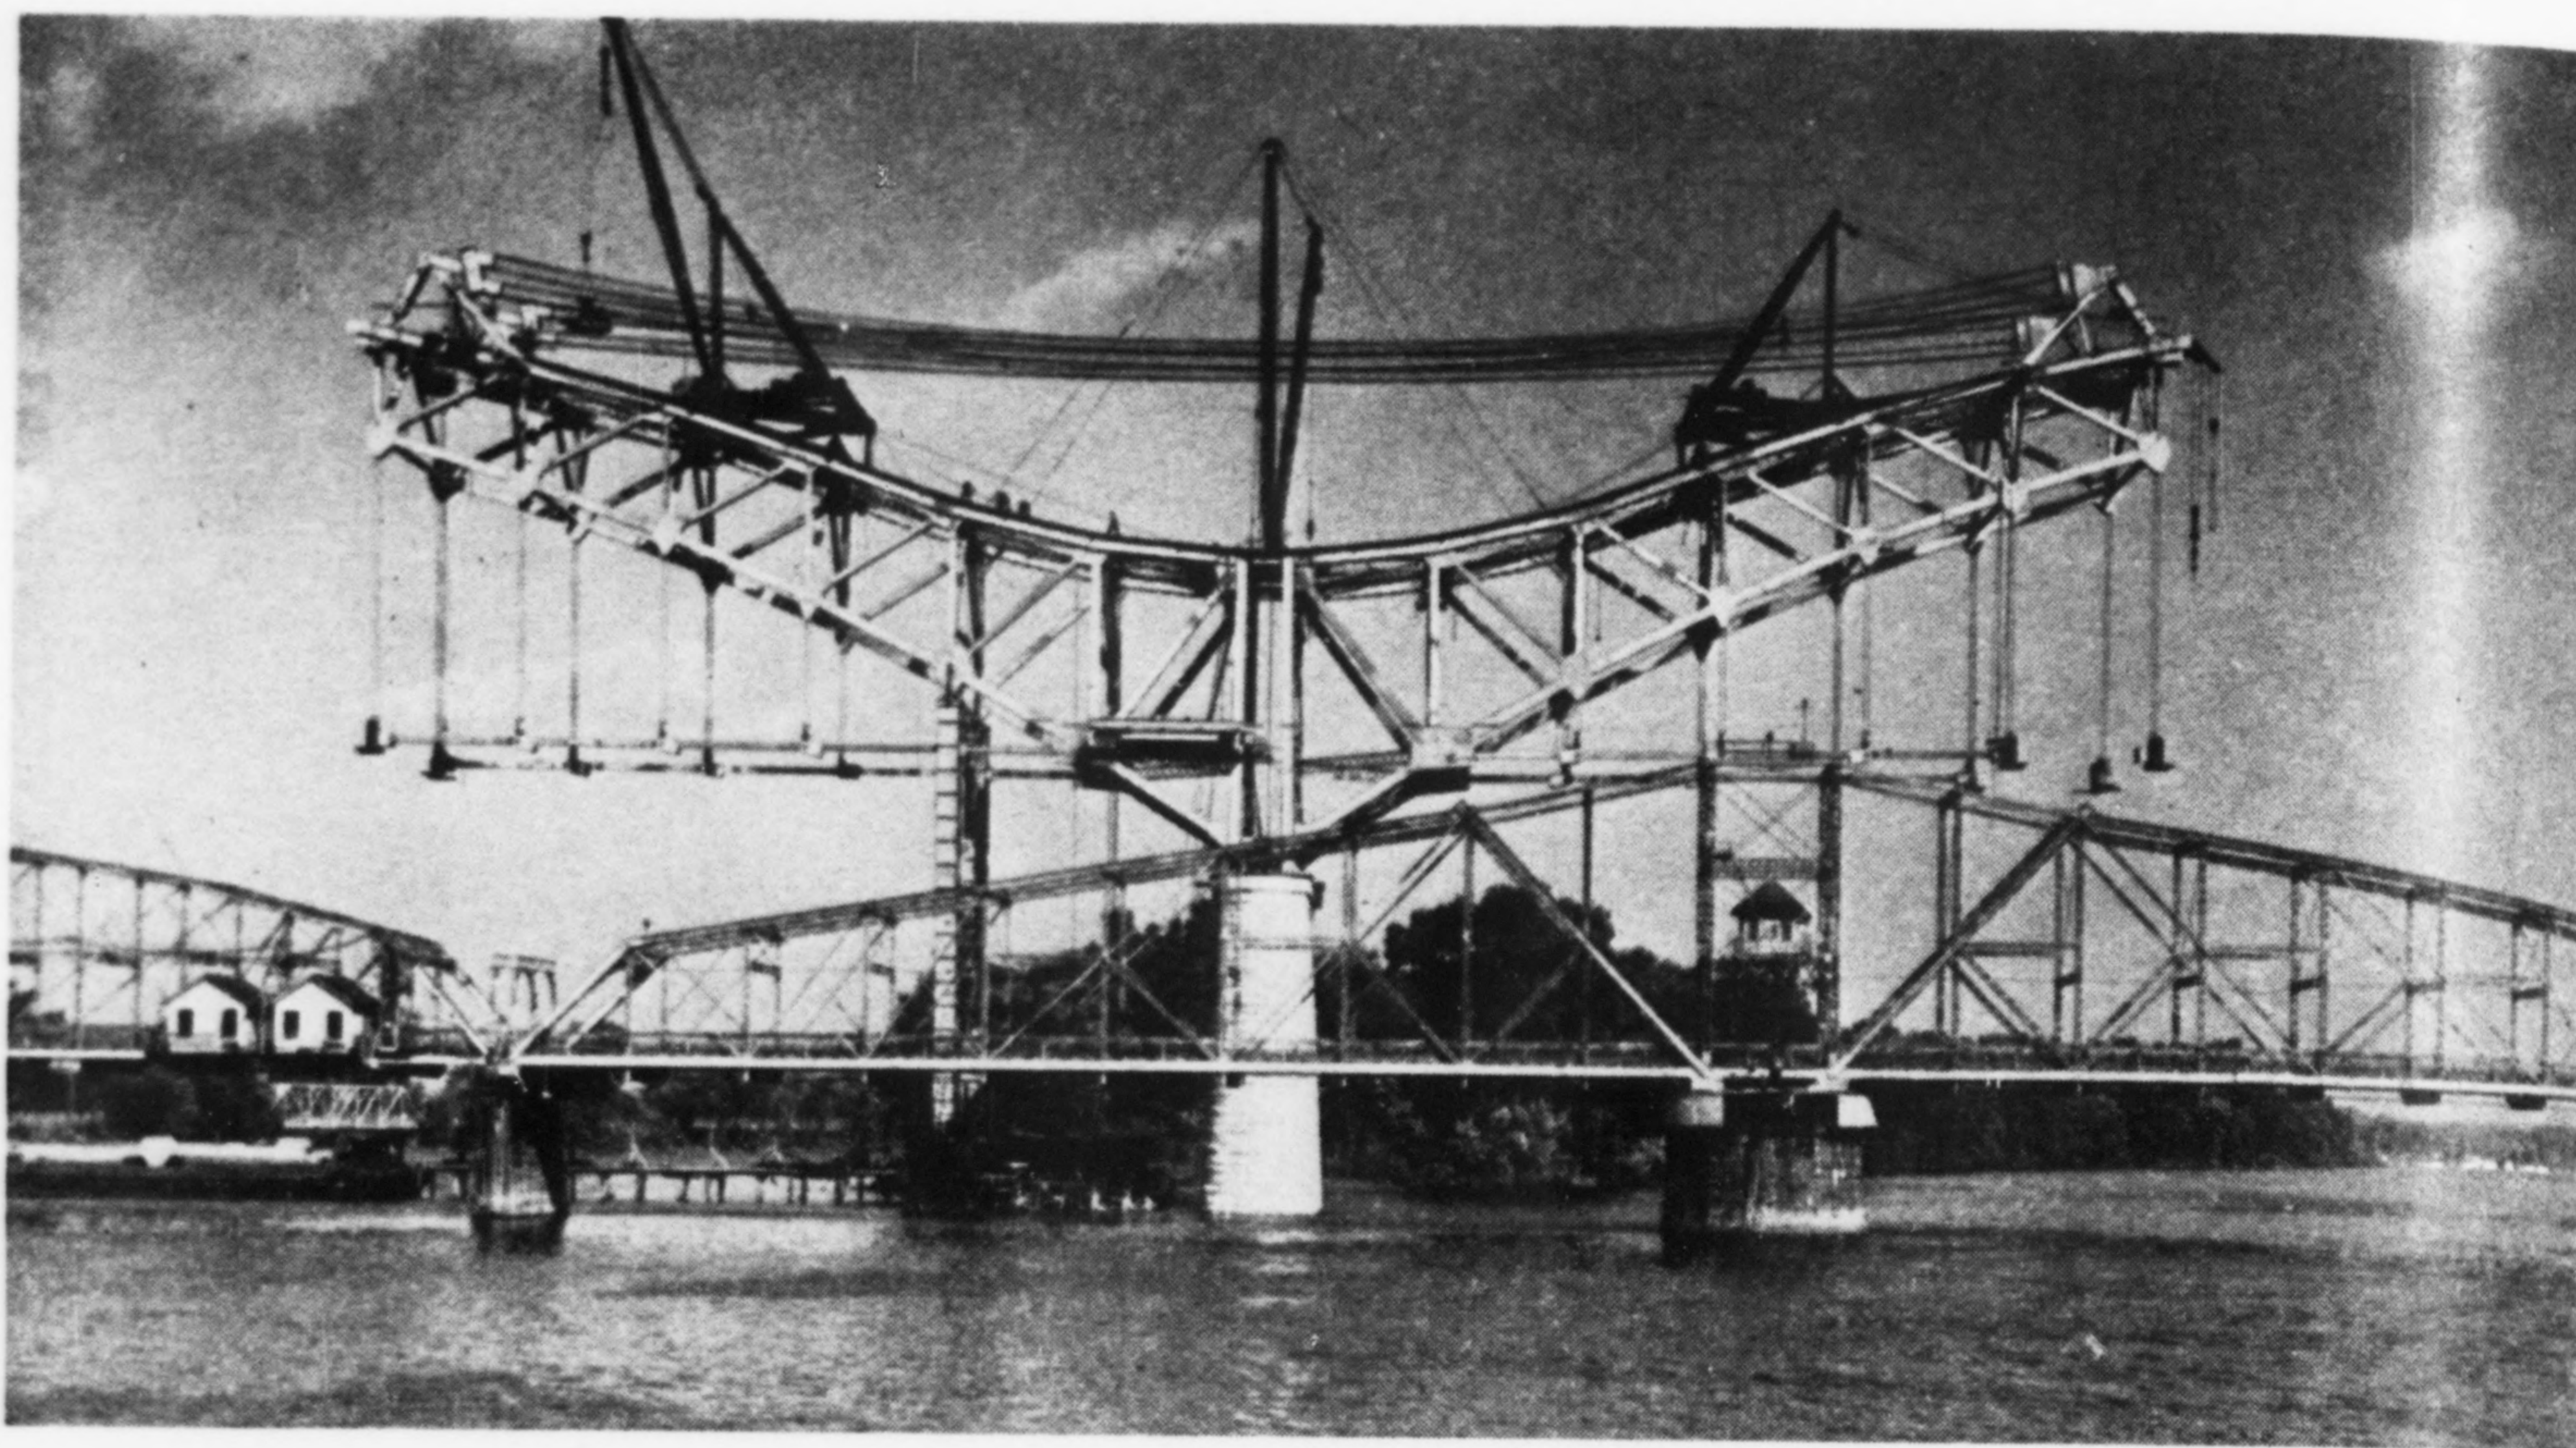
Balanced cantilever erection of twin 600-ft. tied arches about a center pier with the aid of a cable tieback system. The old bridge that is to be removed is in the foreground.
